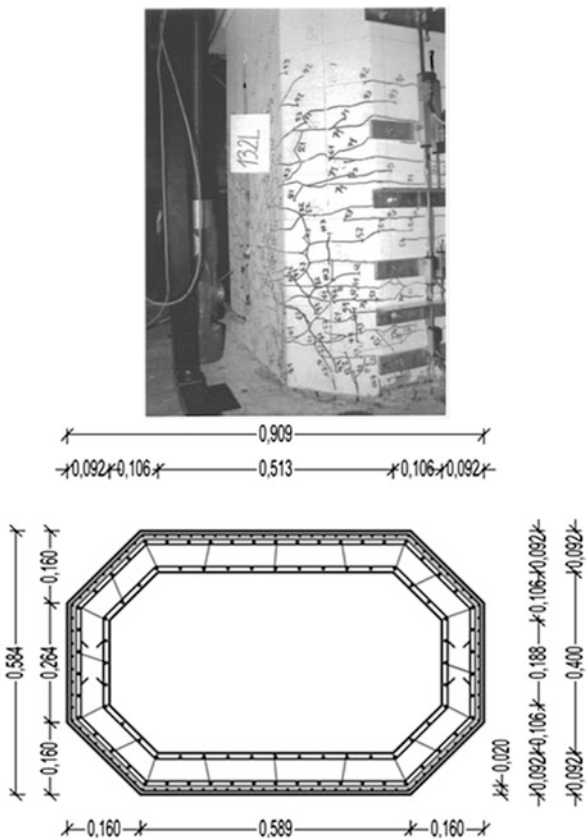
Strengthening of the column, using concrete jacketing – the test specimen
